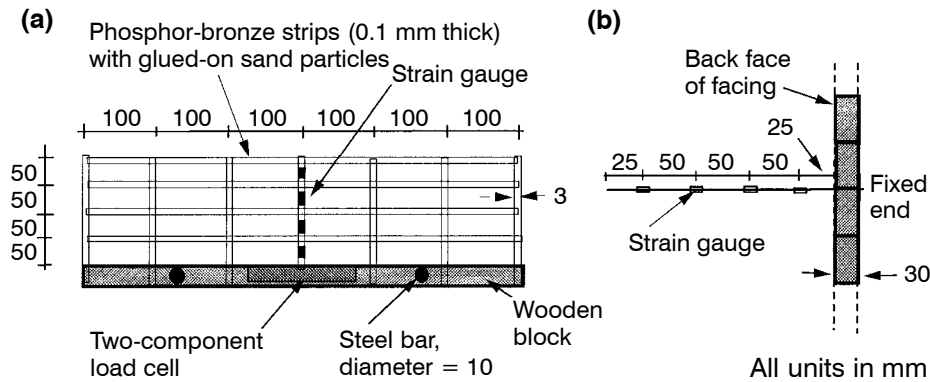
Configuration of the model wall reinforcement: (a) plan view; (b) cross section.
